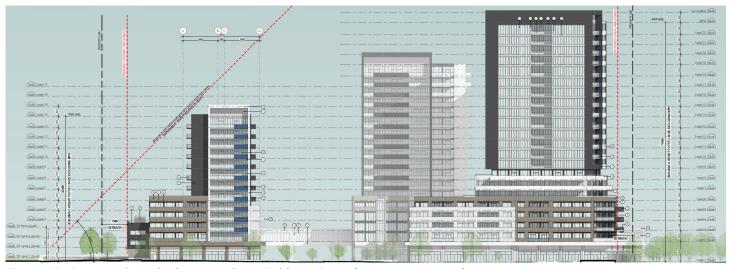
Proposed south elevation along Fieldgate Drive (Source: onespace)
